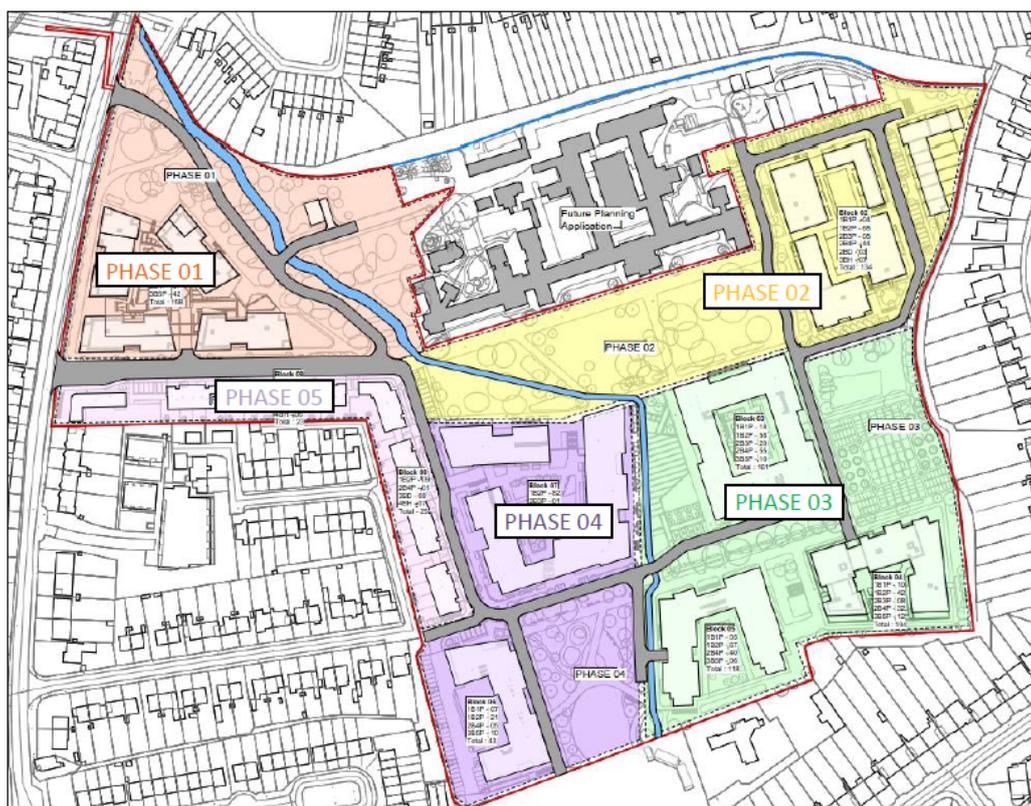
Illustrative Plan showing proposed construction phasing.
